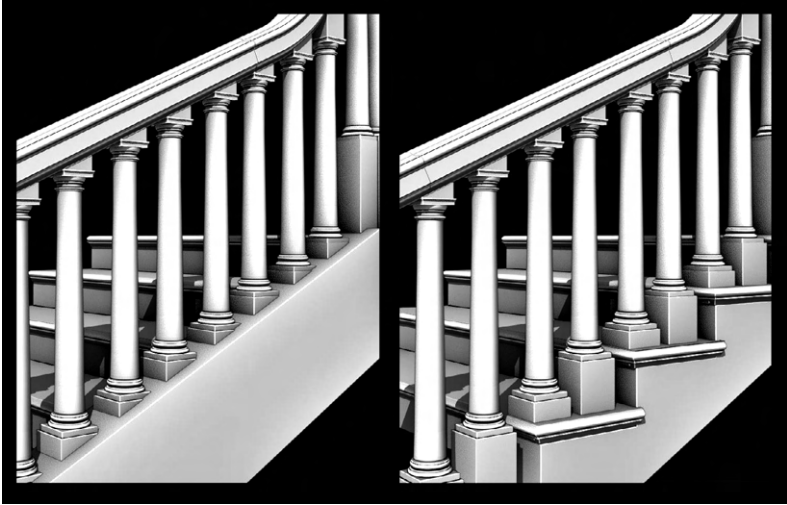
Staircase construction, closed string (left) and open string (right).
